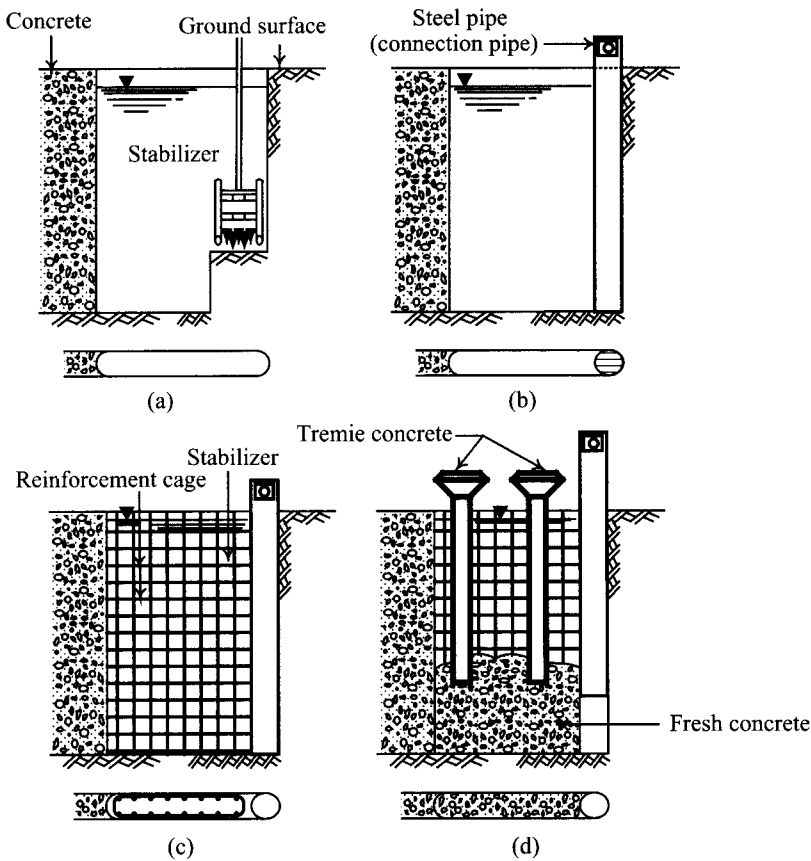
Procedure of construction of a diaphragm wall: (a) trench excavation, (b) steel pipe installation, (c) steel cage placement, and (d) concrete casting (redrawn from Xanthakos (1994)).
